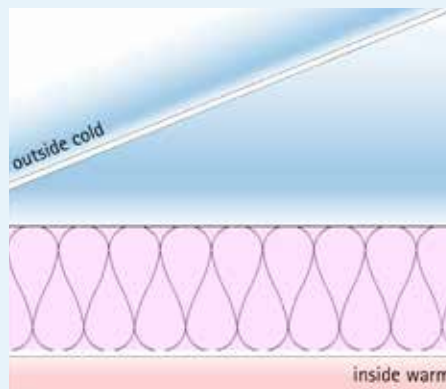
Truss roof – In winter, the external cladding systems & attic void will become colder than the internal linings on the inside of the insulation systems.
